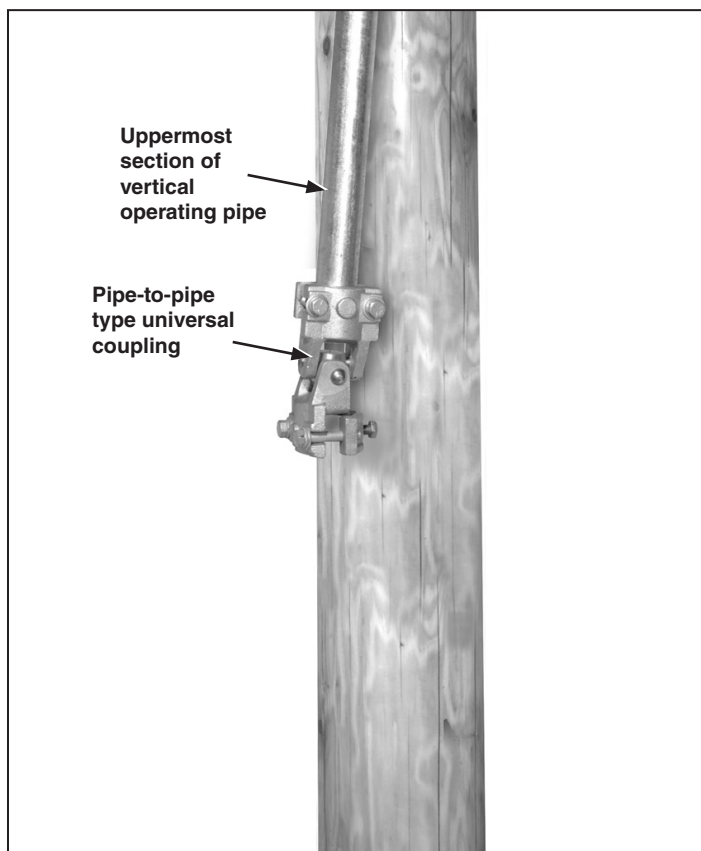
Attach the pipe-to-pipe type universal coupling to the lower end of the uppermost section of vertical operating pipe.
